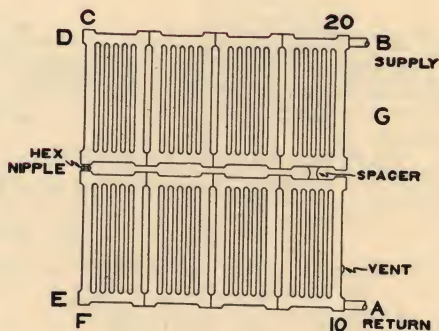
Eight Sections in Two Tiers—Two-Pipe Steam Using Spacing Saddle
